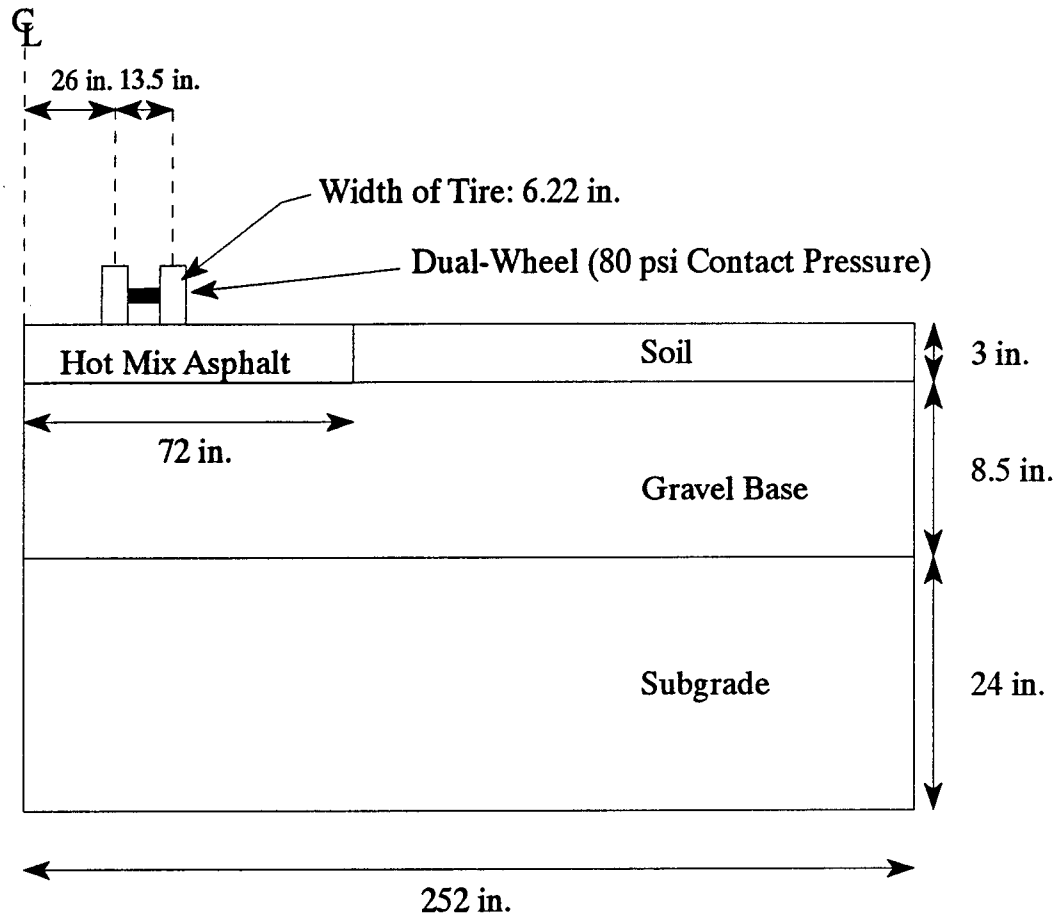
Schematic Details of a 12-foot (365 mm) Wide Pavement Section
